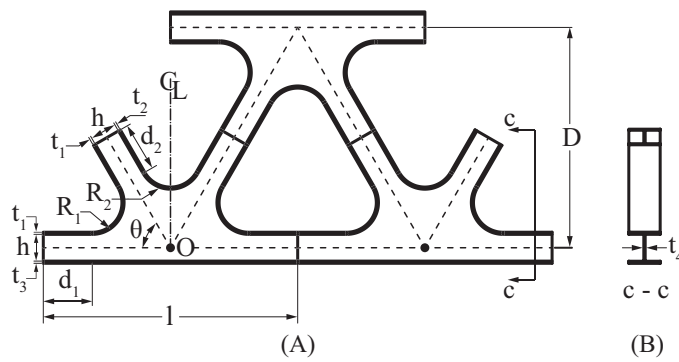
Geometric development of the modular joint: (A) Elevation view of back-to-back modular joints and (B) Section view of one modular joint.
